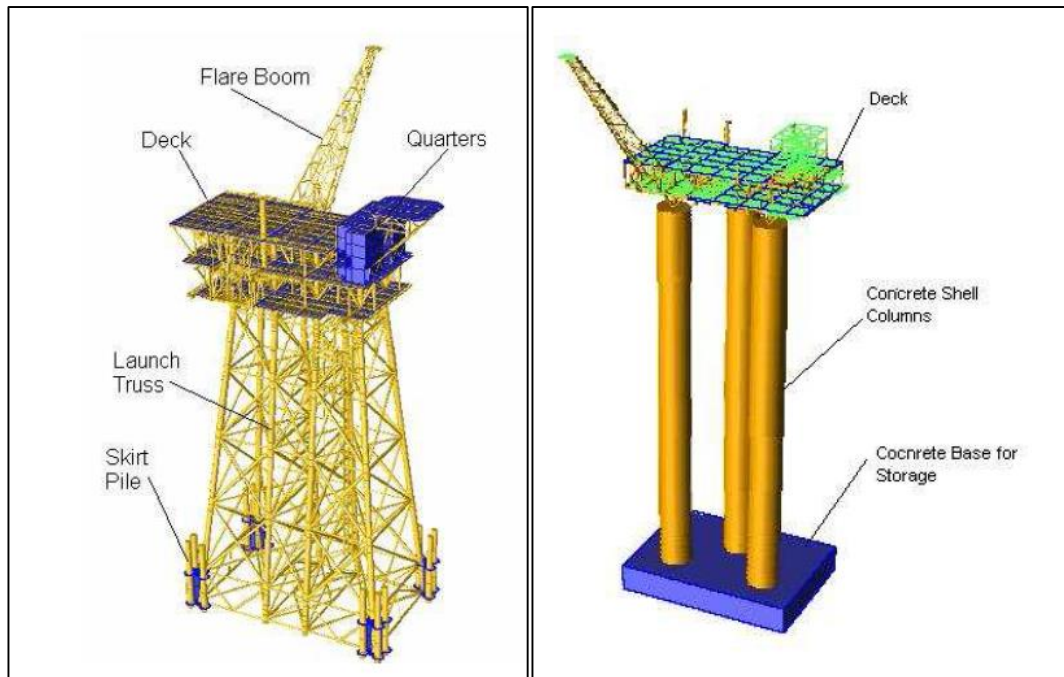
Examples of Steel Template Structure and Concrete Gravity Structure
